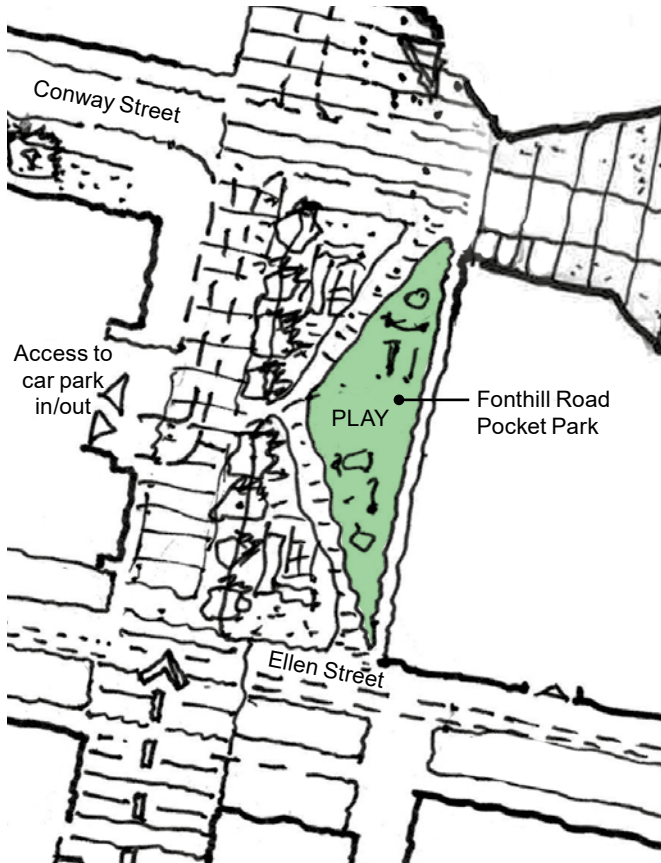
Illustrative sketch plan of the Pocket Park.
